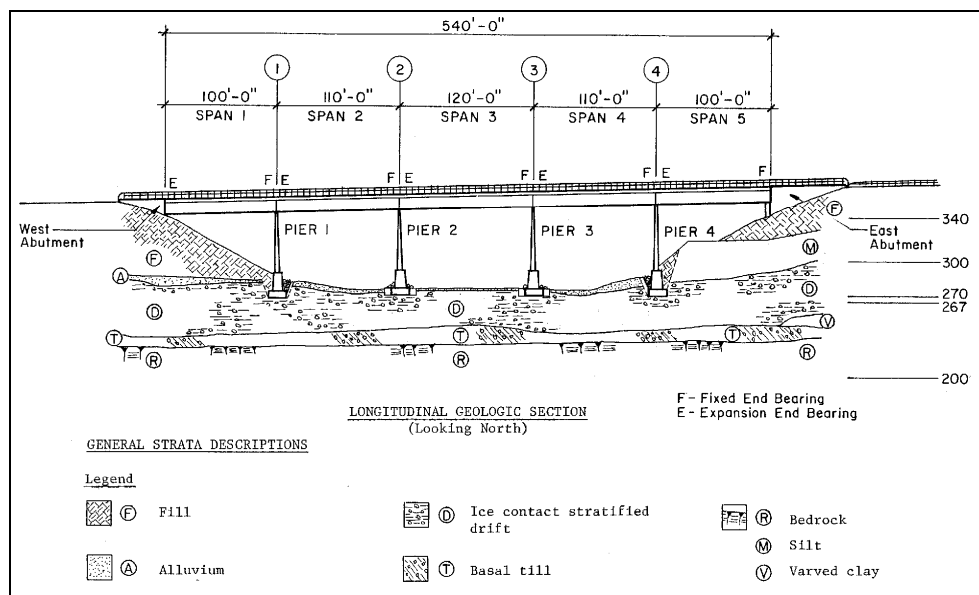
South elevation - Schoharie Creek Bridge showing key structural features and a schematic geological section (Richardson et al. 1987).
